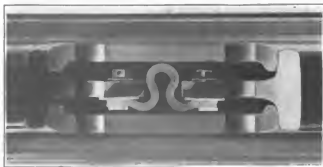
HORIZONTAL SECTION OF BOND APPLIED TO 90-LB. RAIL
